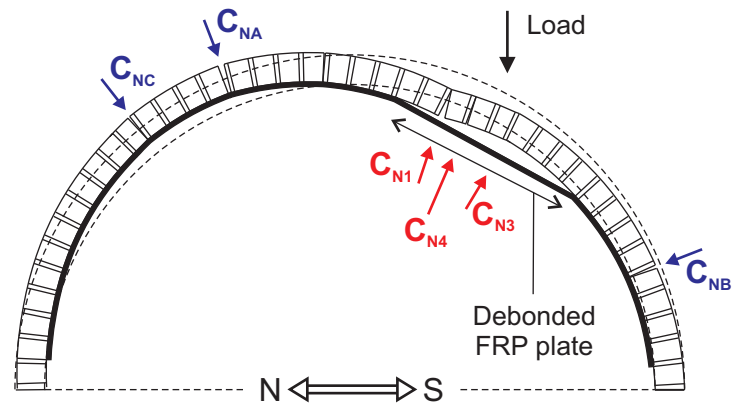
Developed plan view of the arches showing crack locations in the masonry and the extent of debonding after failure of the strengthening system
